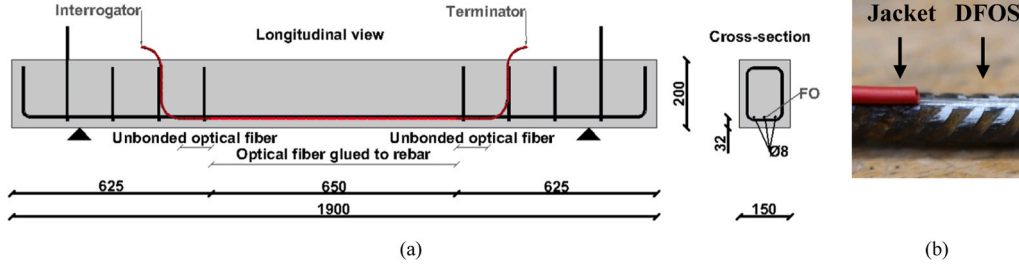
(a) Specimen layout with embedded DFOS and (b) DFOS instrumented on reinforcement bar. Dimensions are in millimeter.
